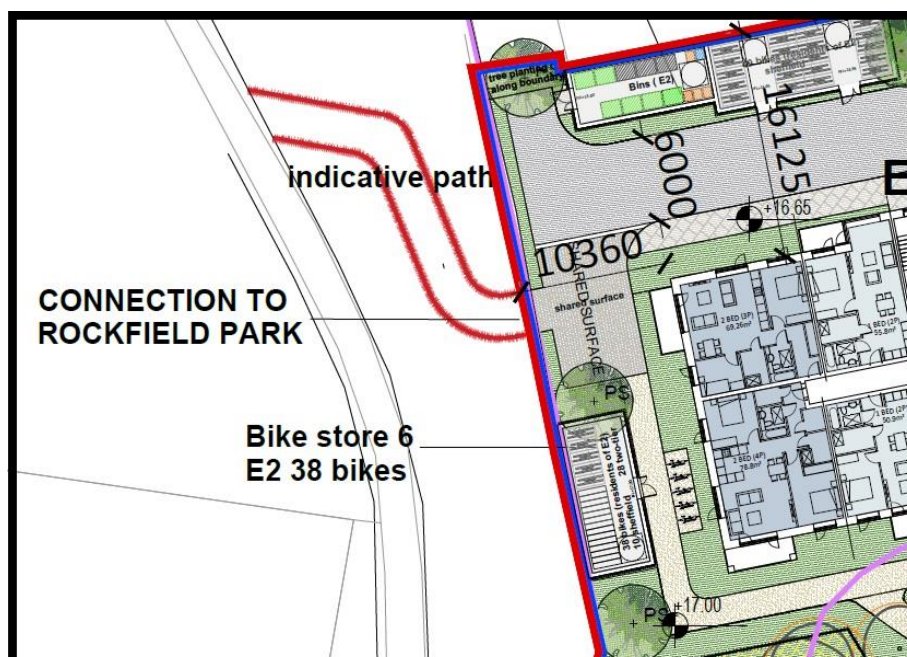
Extract OMP Ground Floor Plans showing Western Boundary
